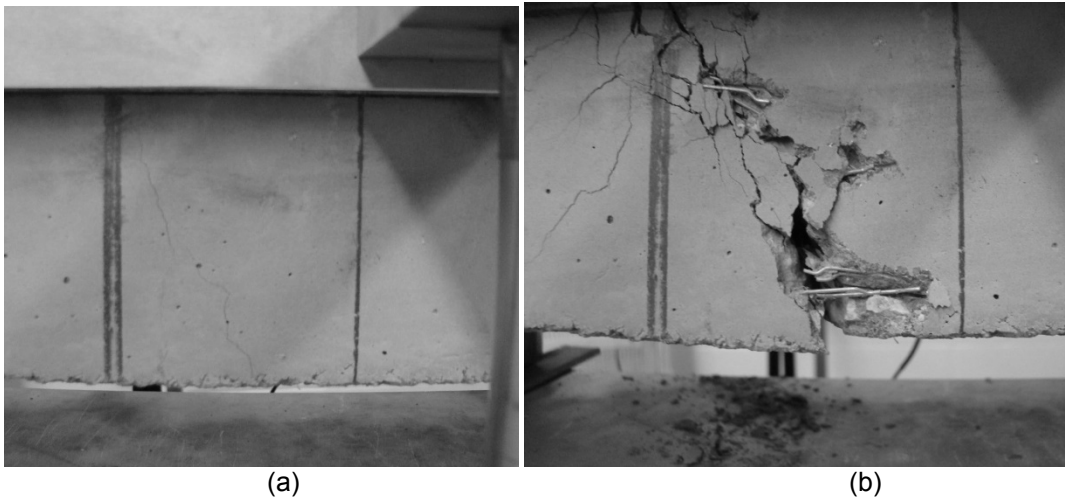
First crack in bottom of beam (a) and crack at end of test (b) for SFRC test beam 1
